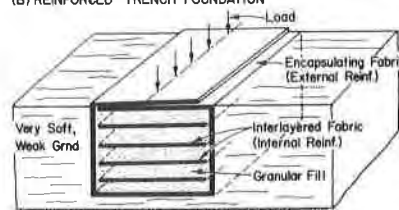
Internally/externally, fabric reinforced below grade foundations.
